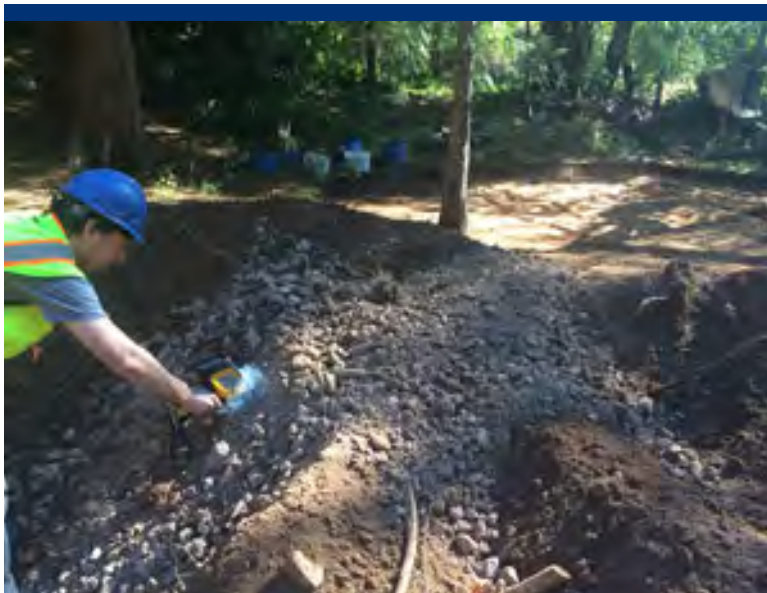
START screening excavated pile tailings from DU05 with XRF.
